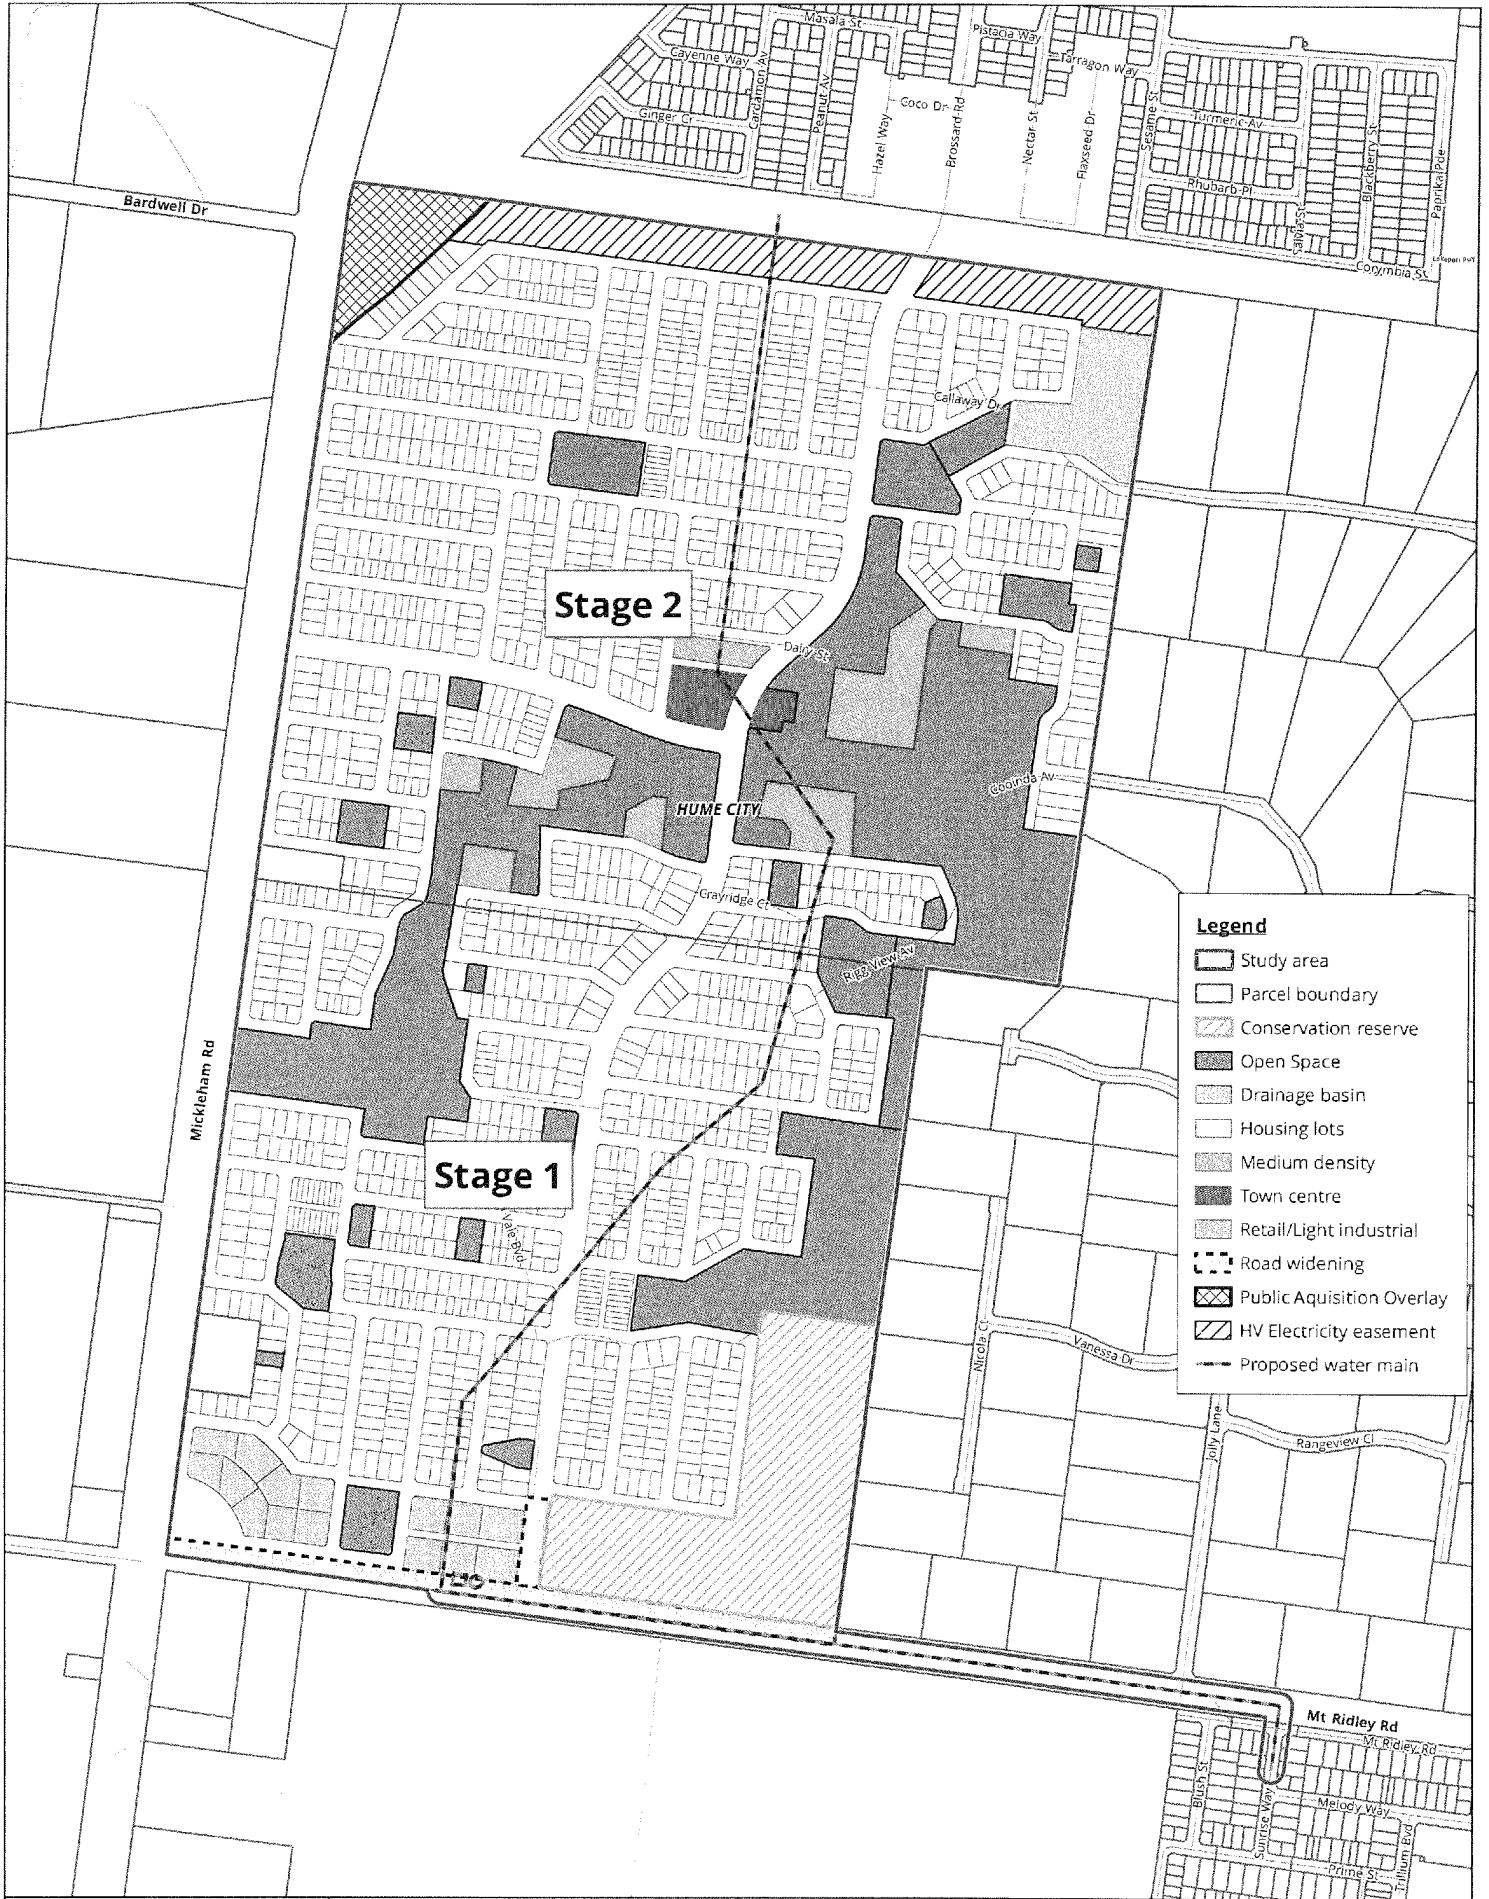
Layout plan of residential subdivision for 1960 and 2040 Mickleham Road
